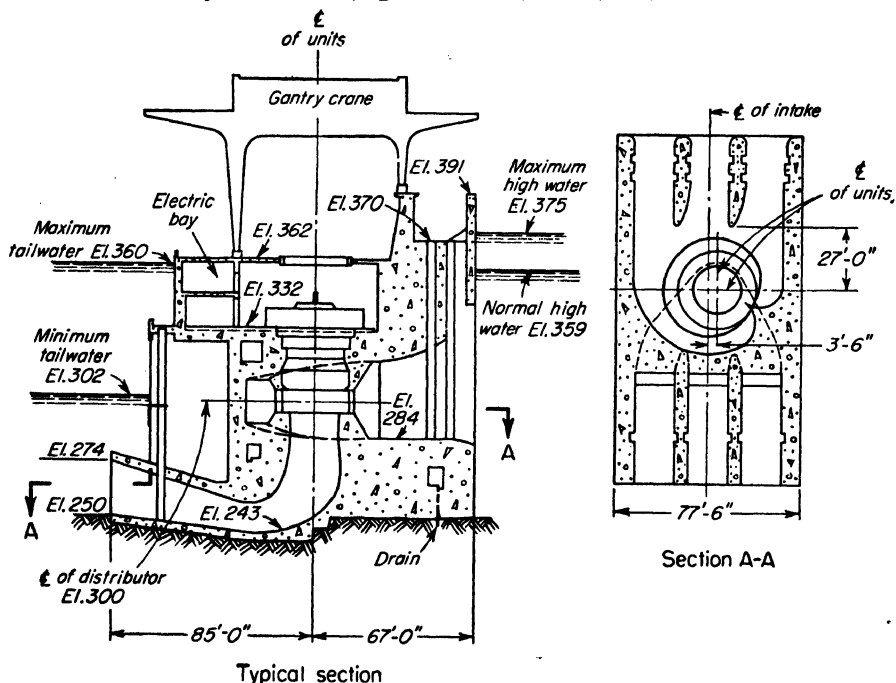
Semi-outdoor plant, Kentucky Dam, T.V.A.
